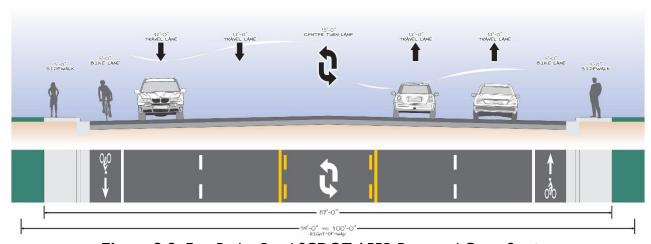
East Butler Road SCDOT APPR Proposed Cross Section
